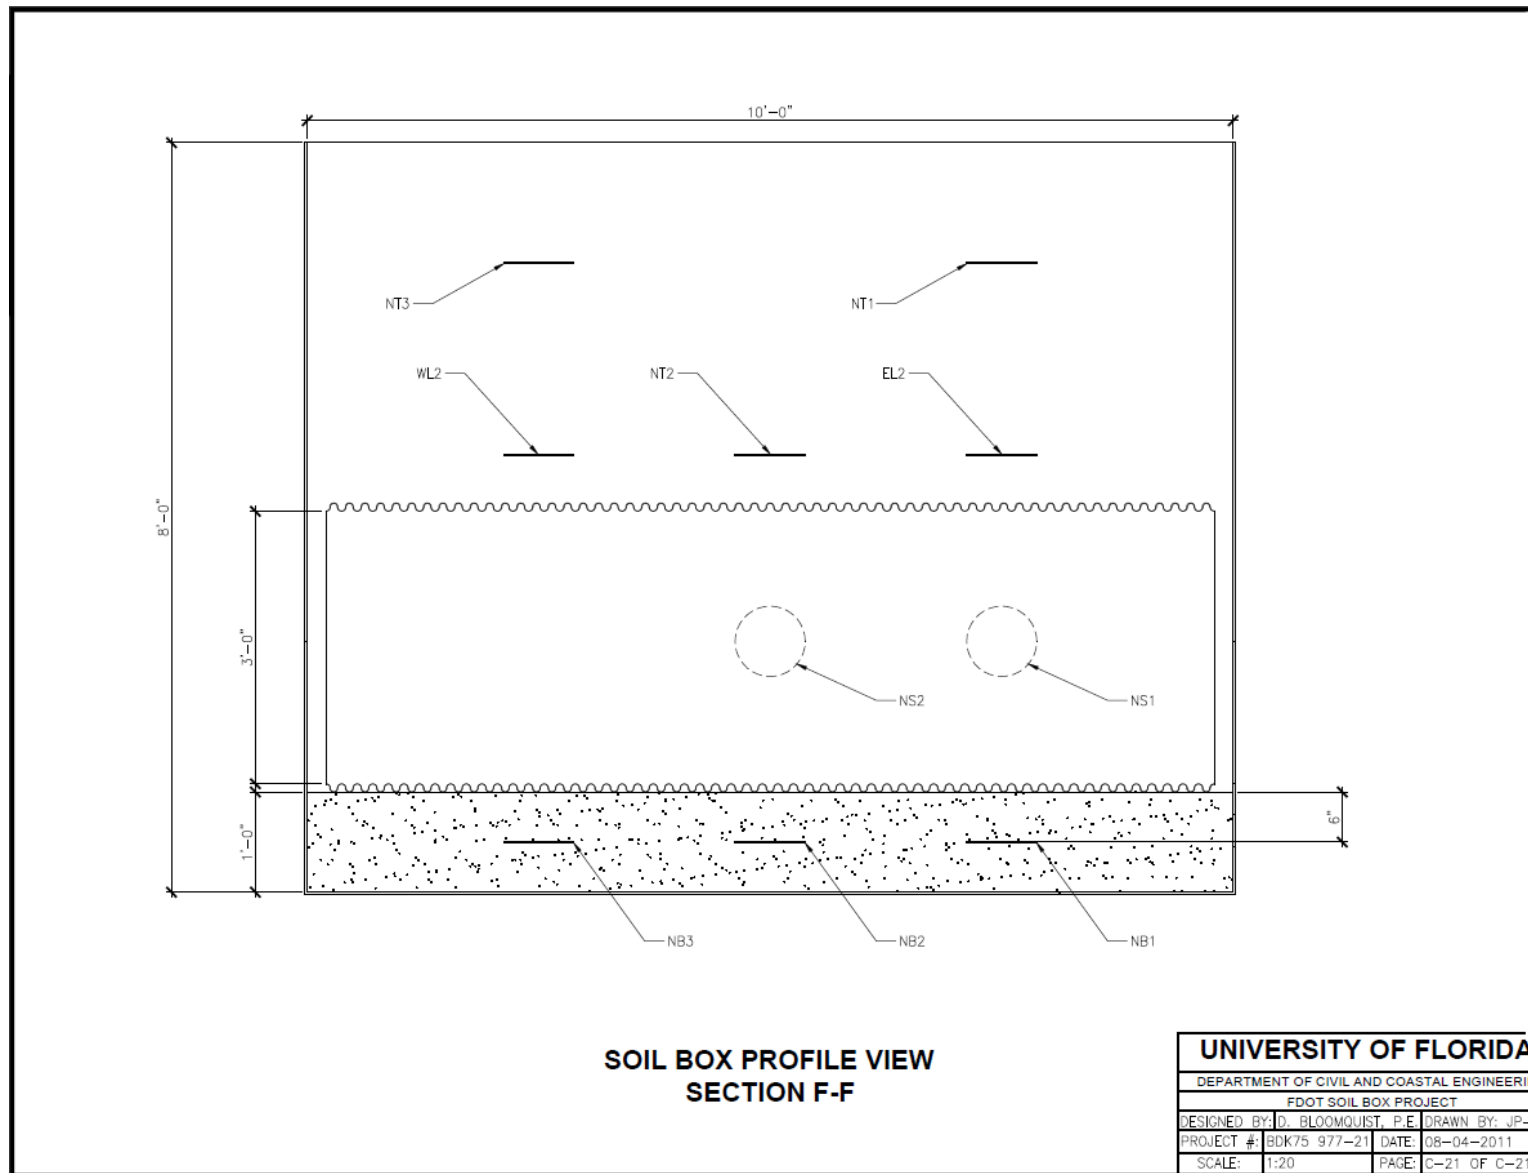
Earth pressure cell layout for PVC pipe test, section F-F.
